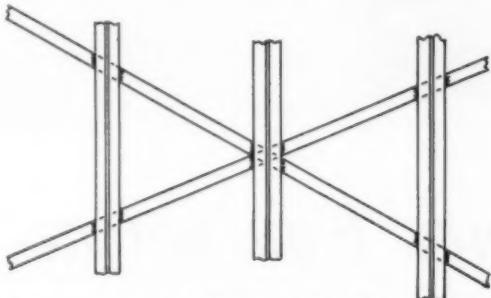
Bottom-Lateral Rod Bracing Replaced with Flat Bars Welded to Bottom Flanges of Stringers
